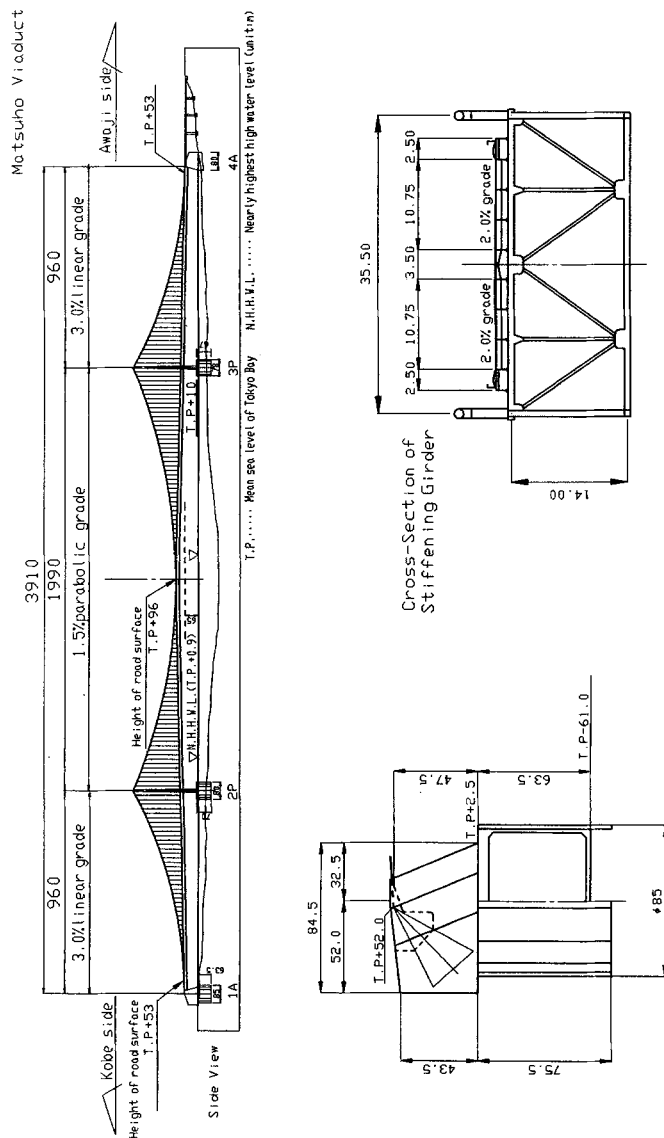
Site Plan and Elevation of Akashi-Kaikyo Bridge
